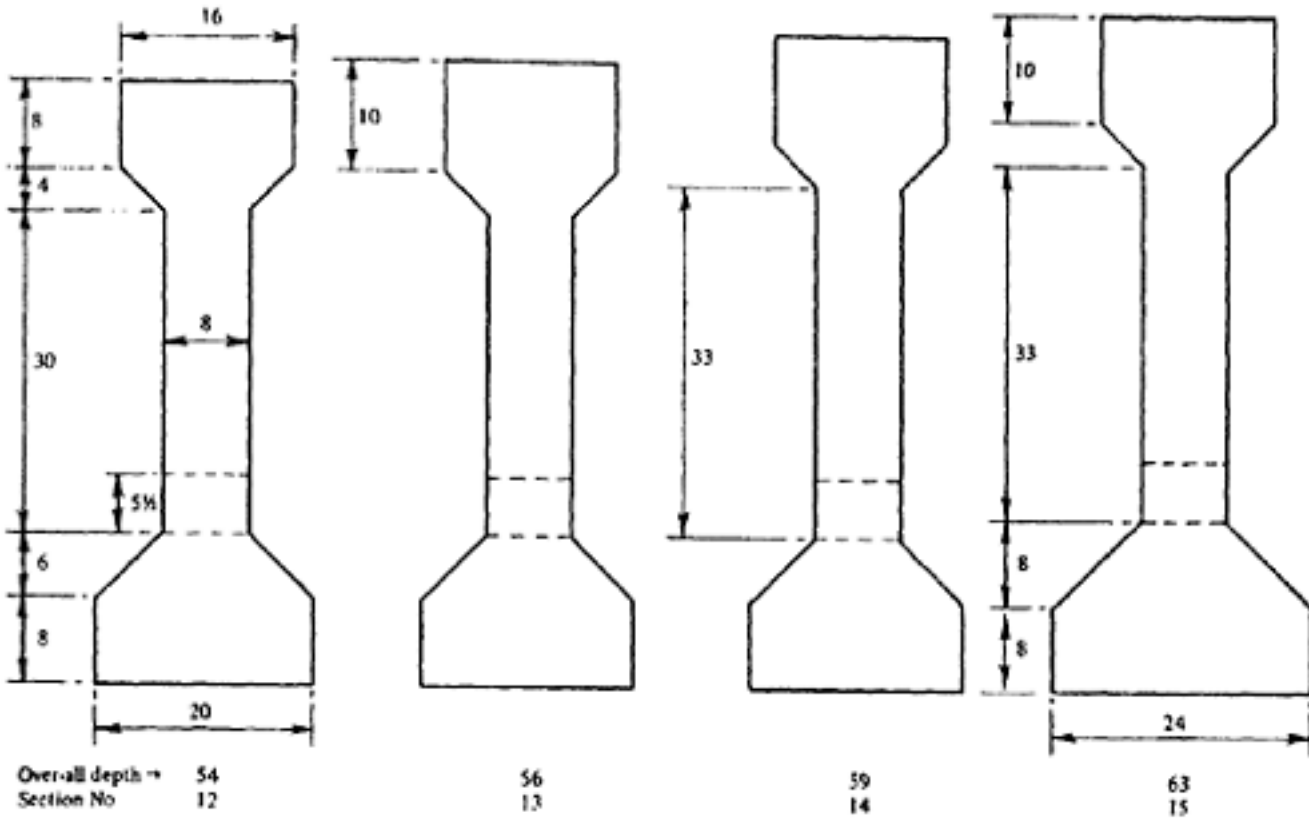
Standard bridge beam (U.S.A.) to span up to 140 ft (43 m)
